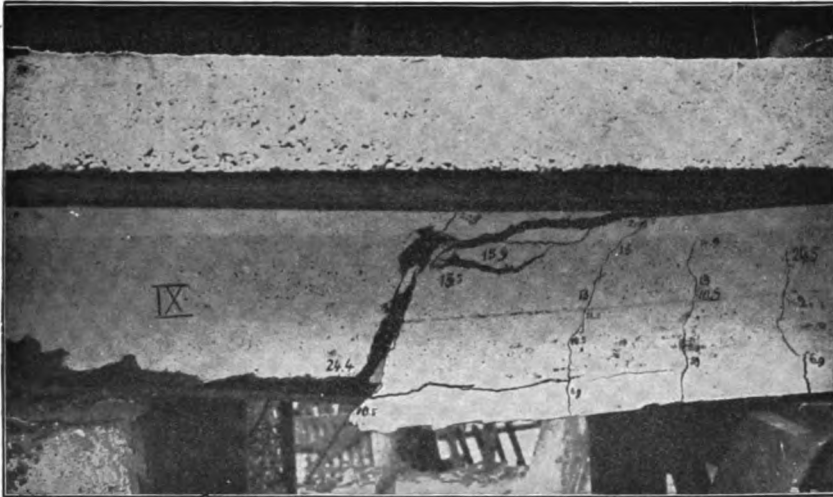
Beam IX, No. 2 rib, under the breaking load.
